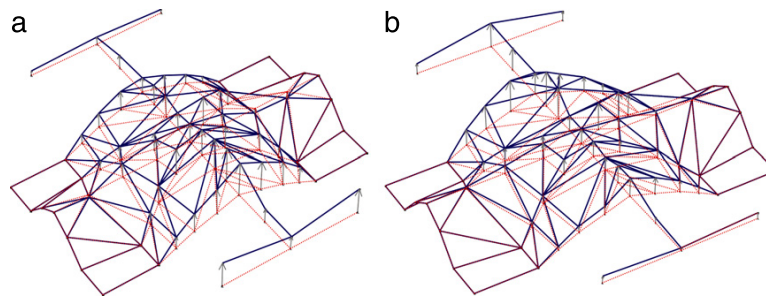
The first mode shape of (a) undamaged vault, (b) damaged vault.
